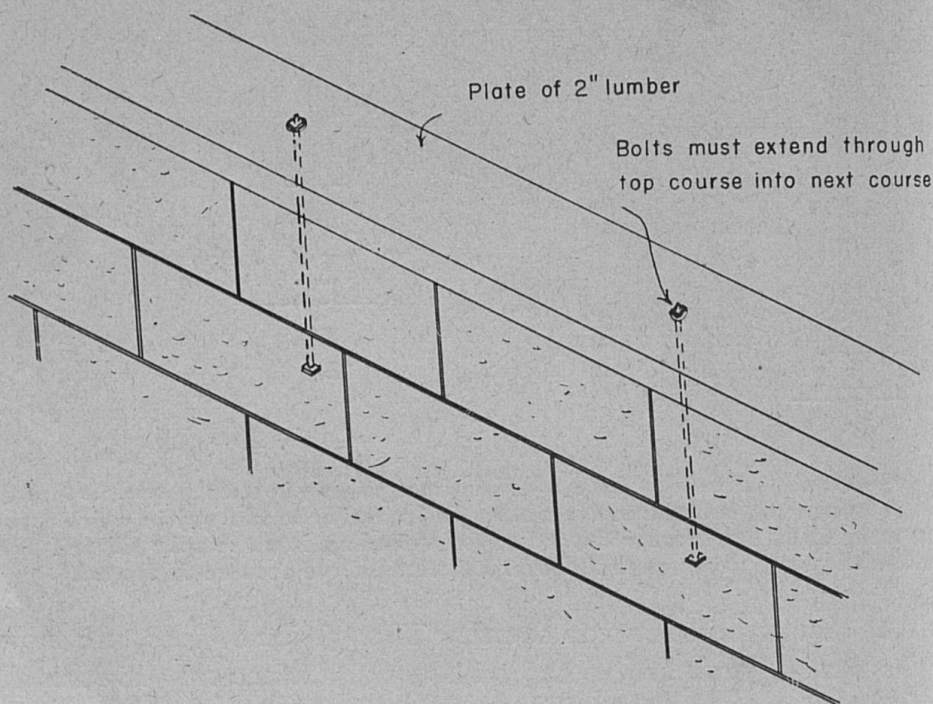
Upon completion of a block wall, it is necessary to add a wooden plate in the manner shown. This plate furnishes a base to which the roof may be tied.
